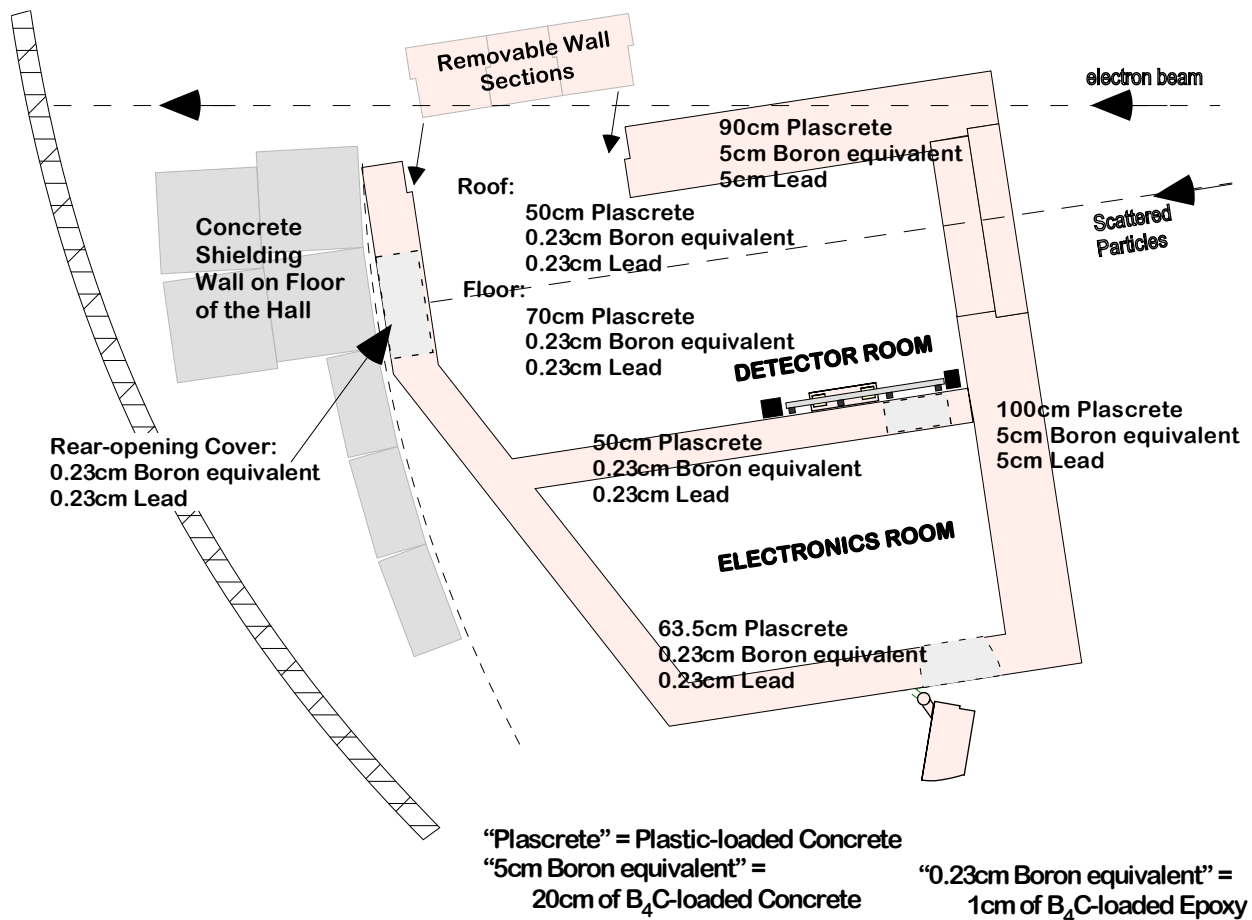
Plan View of the SHMS Shield House showing the layout, thickness, and composition of the walls.
